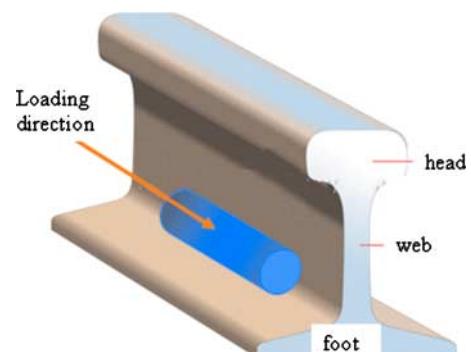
Welding of a bolt on modified rail type UIC-54 [7,12].
